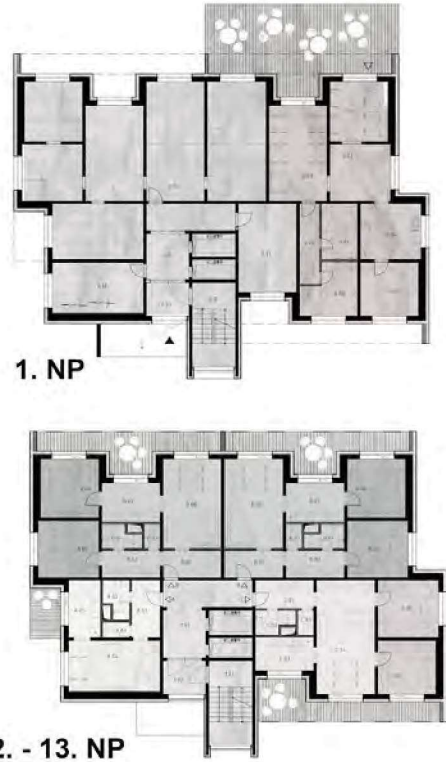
Interventions in the layout after enlargement of loggias, parterres and typical floors (Zdroj: „Back to the future“ design)
